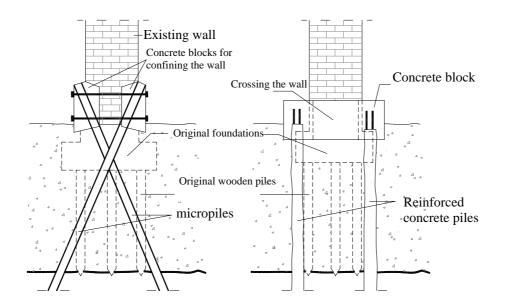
Reinforcement of existing foundations with insufficient or degraded wooden piles: (a) with micropiles, (b) with concrete piles [20]
